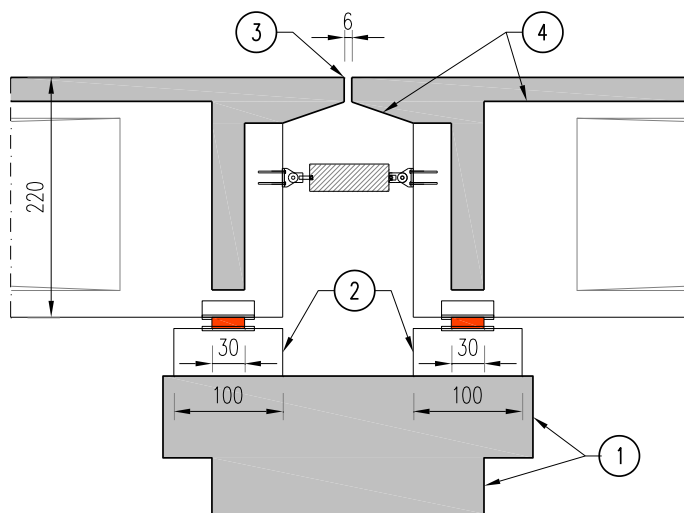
Structural repair works / Interventi di ripristino strutturale.
